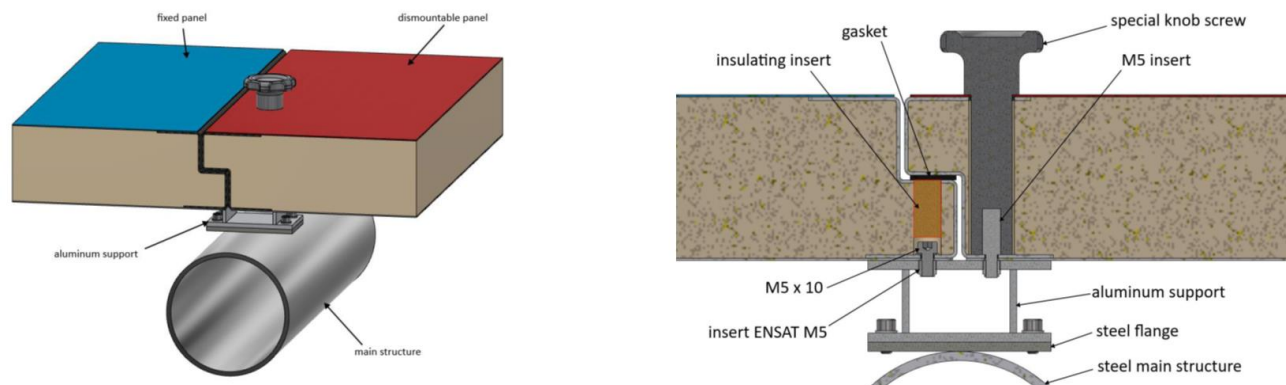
MORFEO Thermal Enclosure: junction between two panels – left side; Thermal Enclosure: Panels fixing - 3D layout section - right side.
